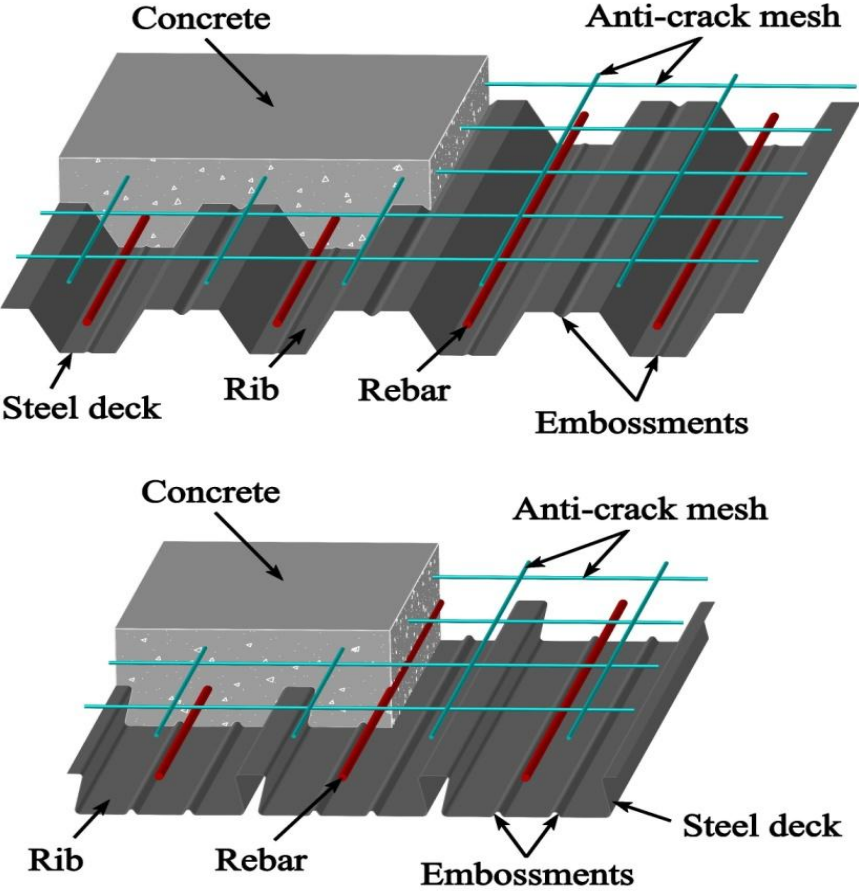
Typical layout of composite slabs: trapezoidal and re-entrant profiles[1].
